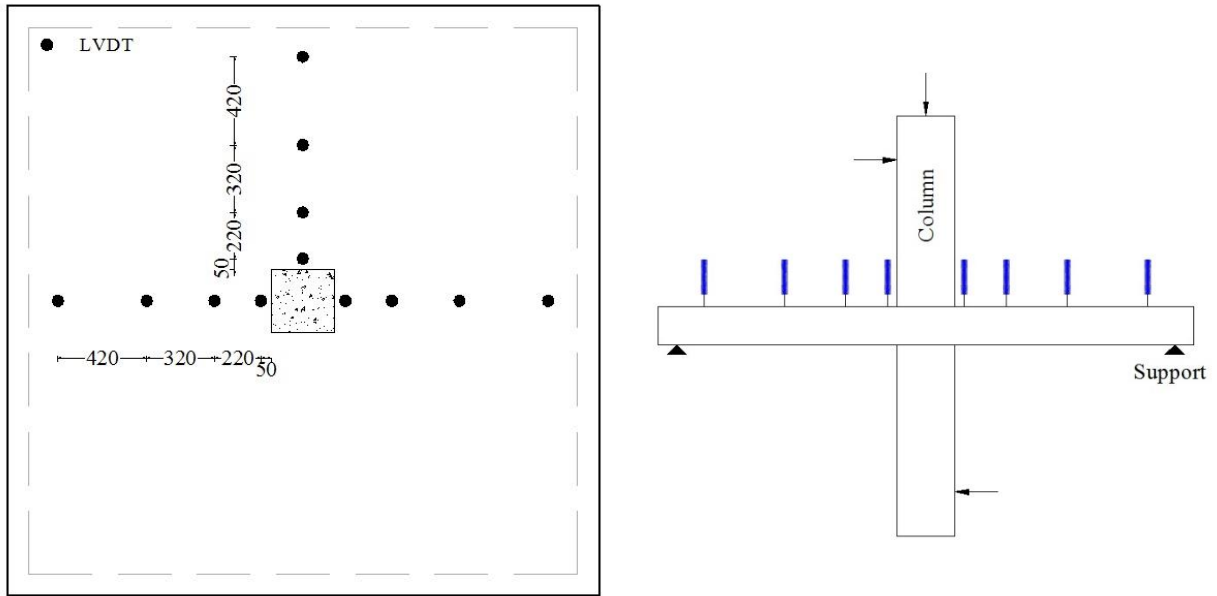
Typical arrangement of LVDTs (all dimensions are in mm)
